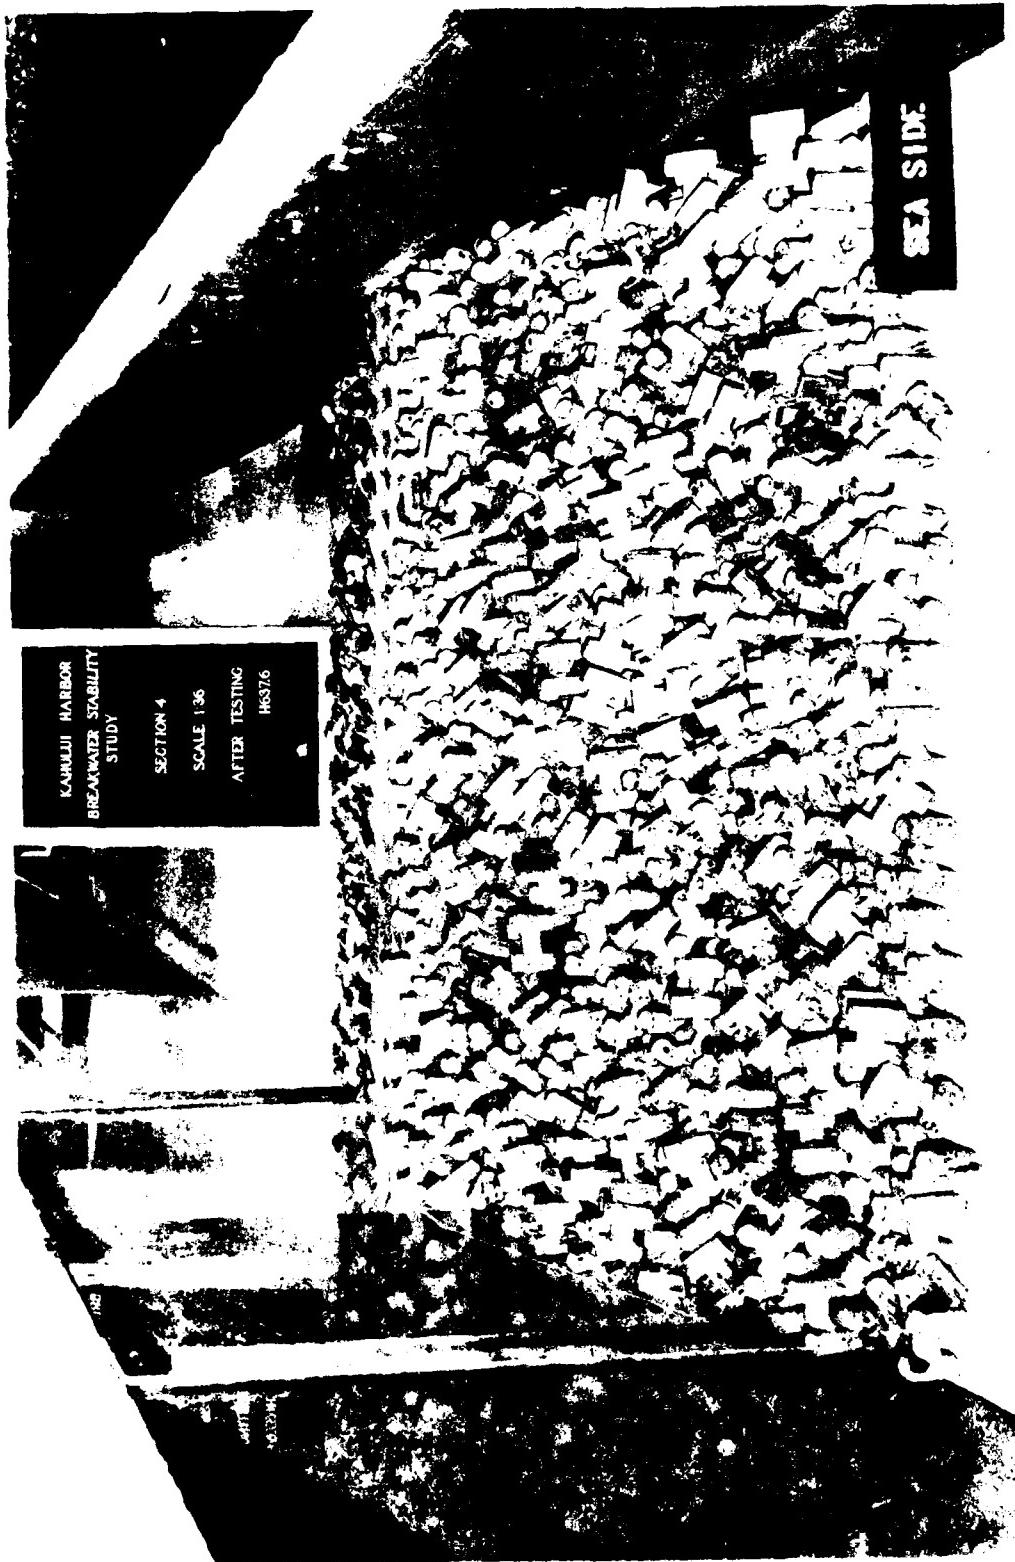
Sea-side view of Plan 1 after testing, 1st test
